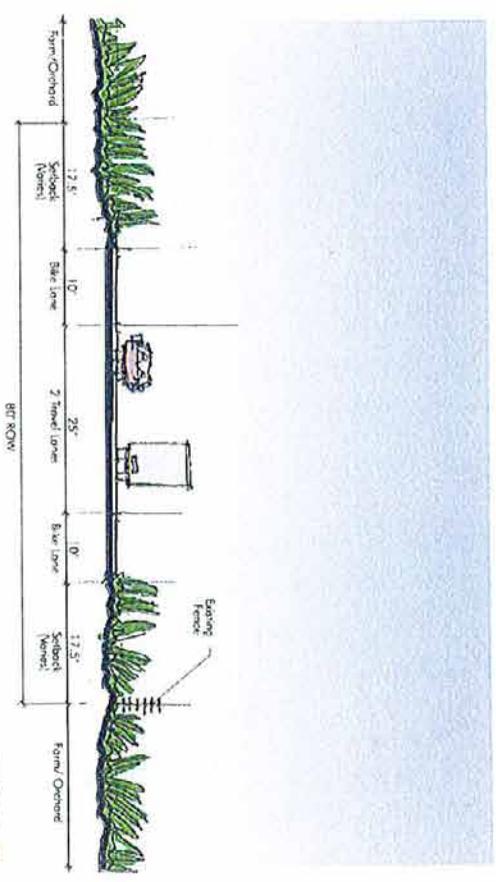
CROSS SECTION OF EXISTING CORRIDOR (COUNTY ROAD)
